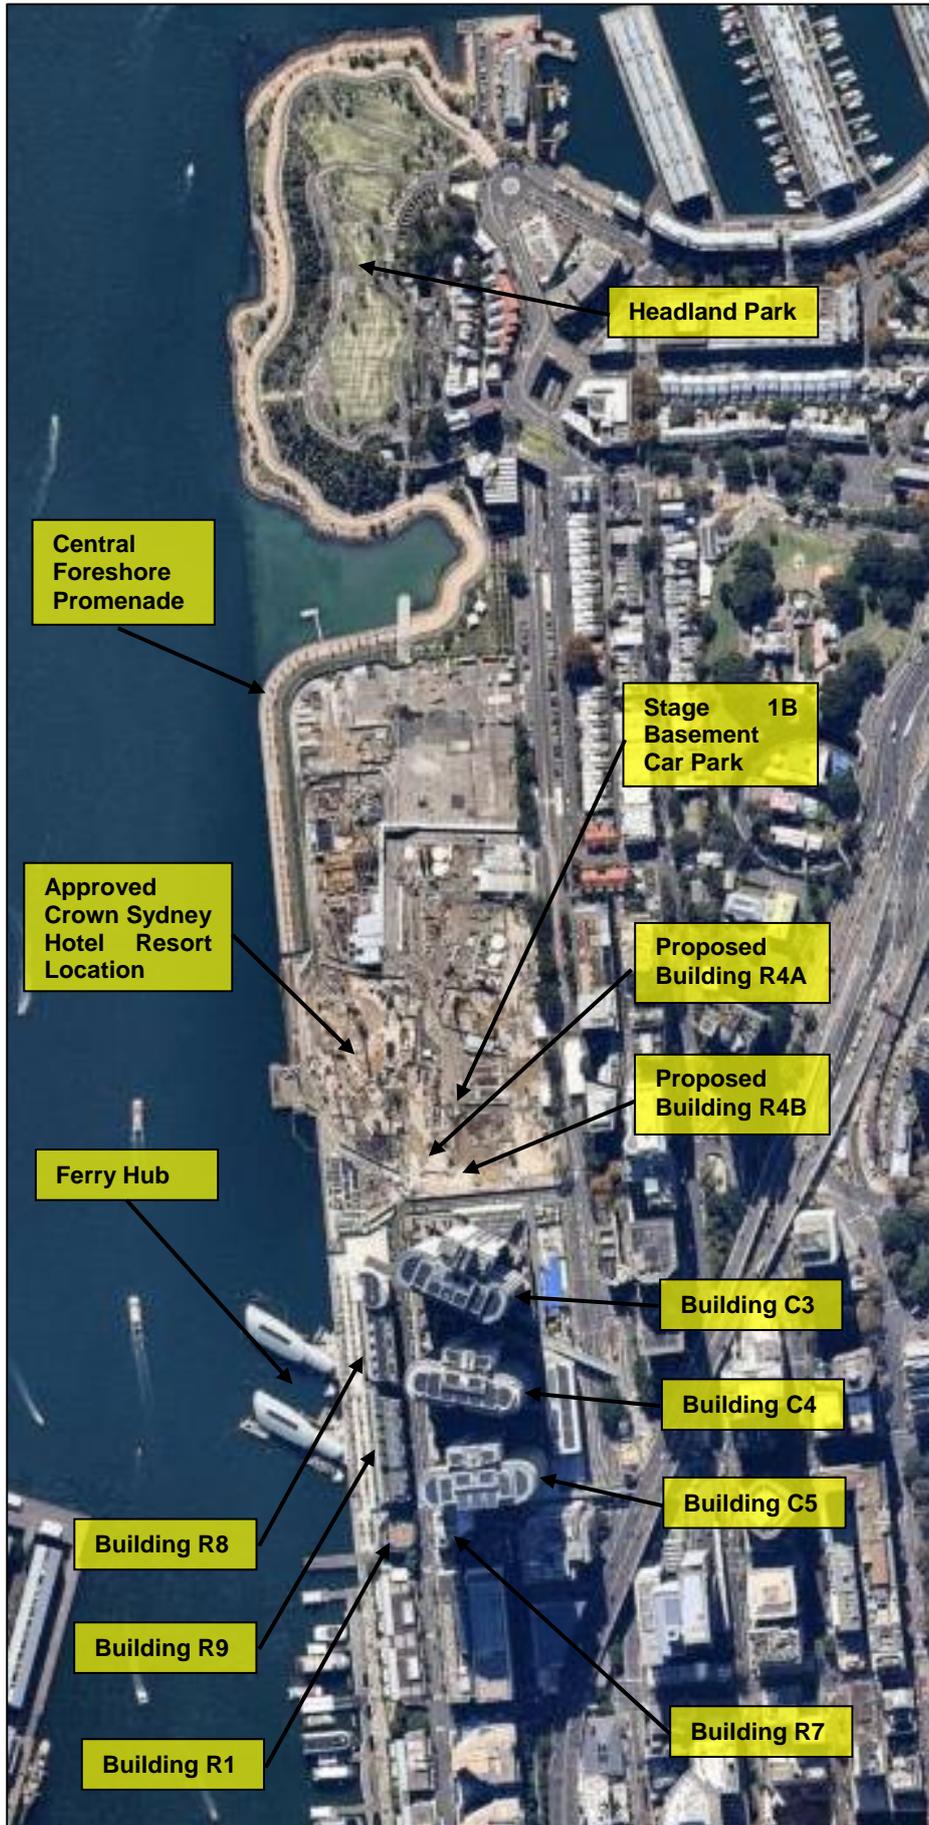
Barangaroo construction and completed projects plan (Base source: Nearmap)
